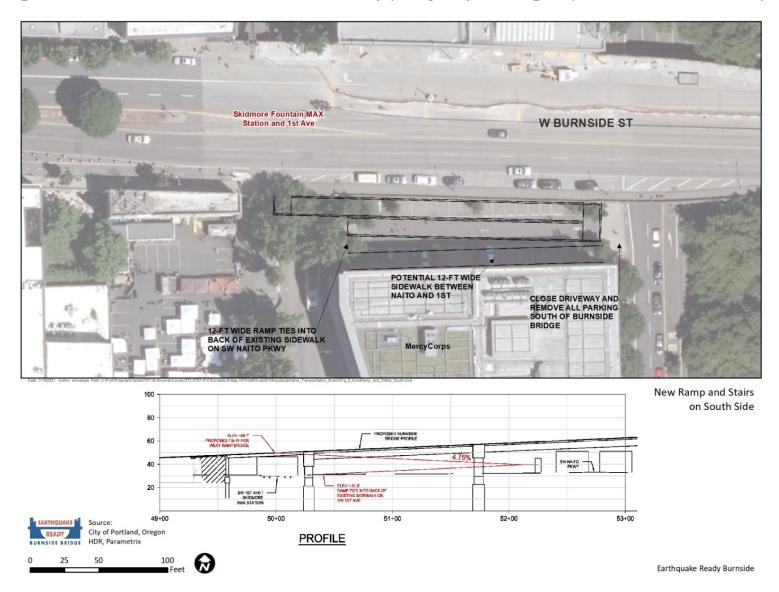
In-Kind Stairs on North Side; New Ramp (Saturday Market Admin Site) and Stairs on South Side
